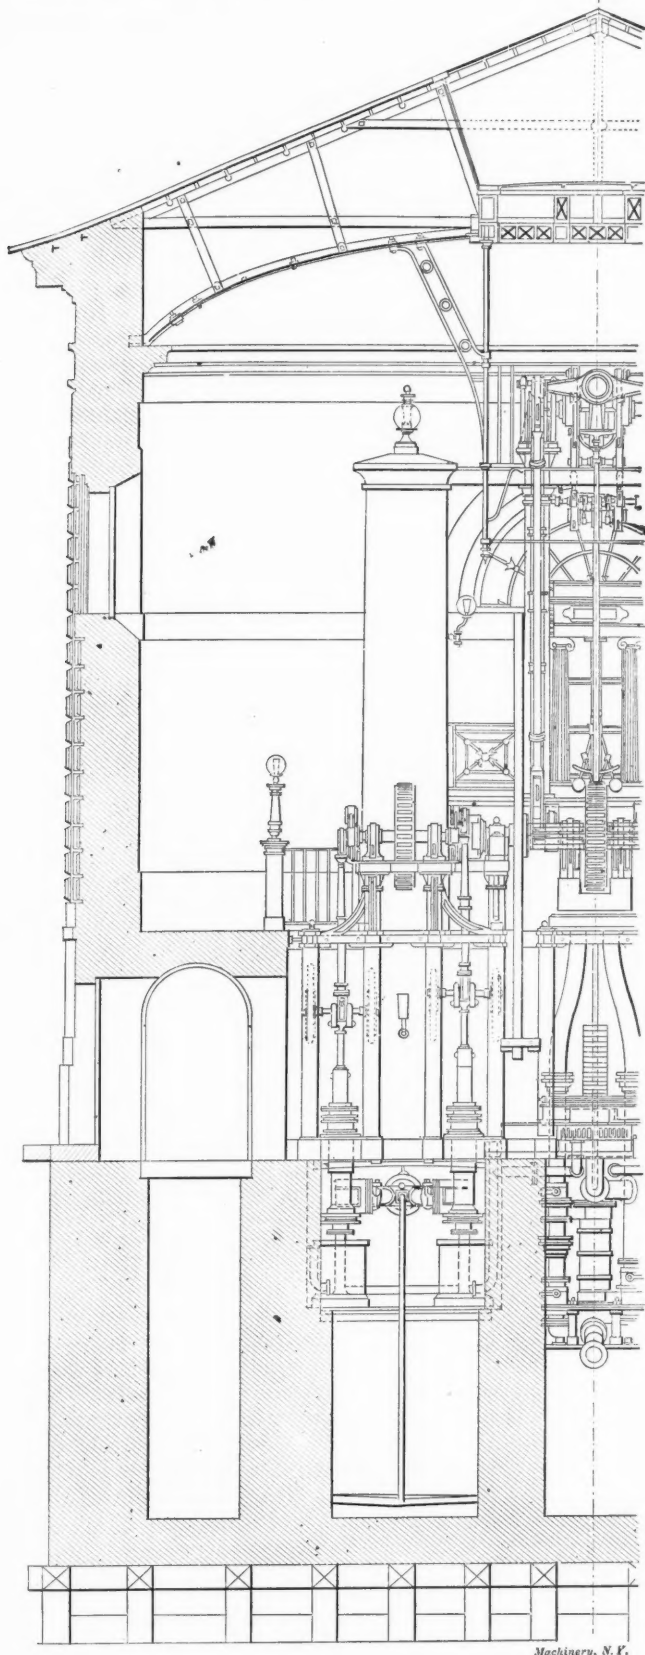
Details of Building and Arrangement of Pump Cylinders.
